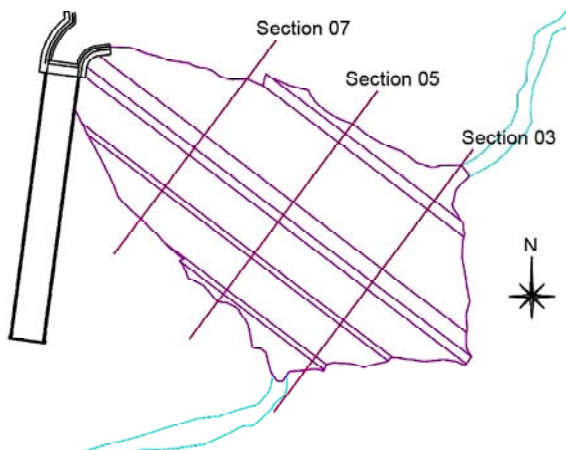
Plan of instrumented sections in Tange-Hamam Dam.
